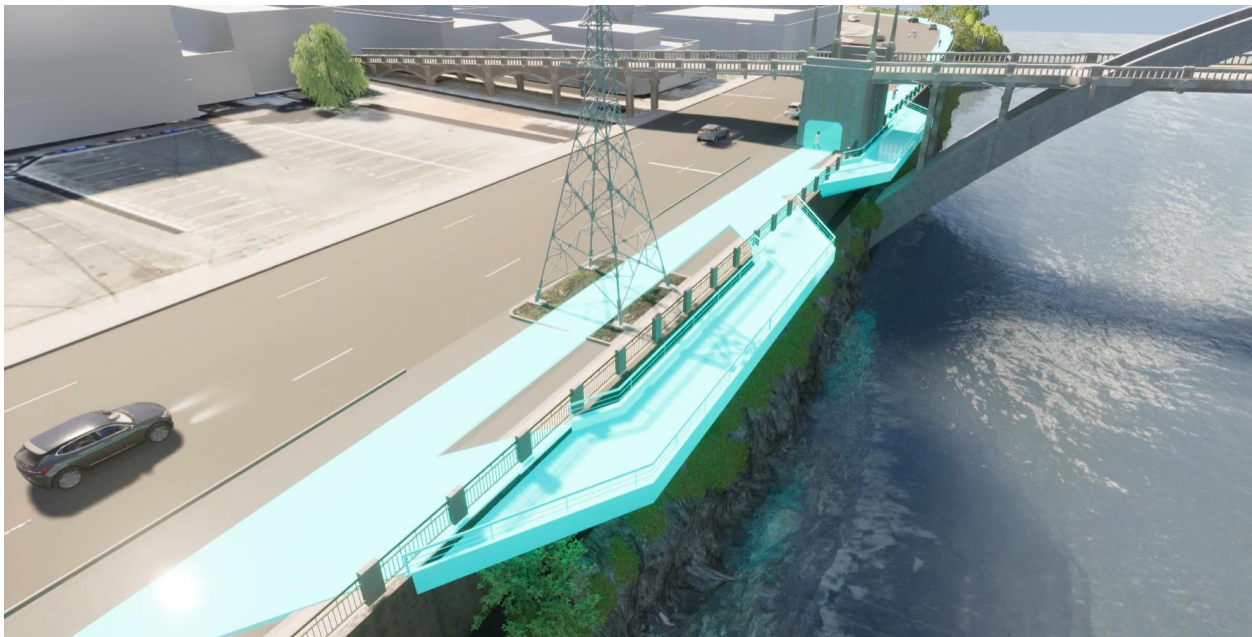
shows two sub alternatives to traverse the Historic Arch Bridge. These include an alignment through the arch pilaster as well as a separate structure around the arch pilaster, fully avoiding impacts or modifications to the arch pilaster.
